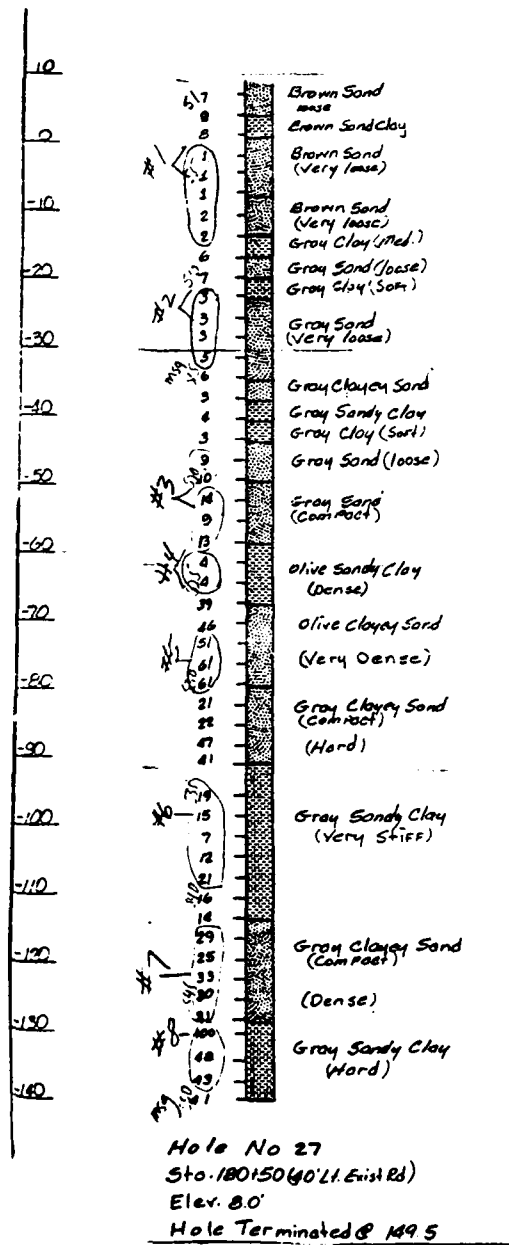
Boring Log Summary, Choctawhatchee Bay Bridge FSB 26 (Site 21)
